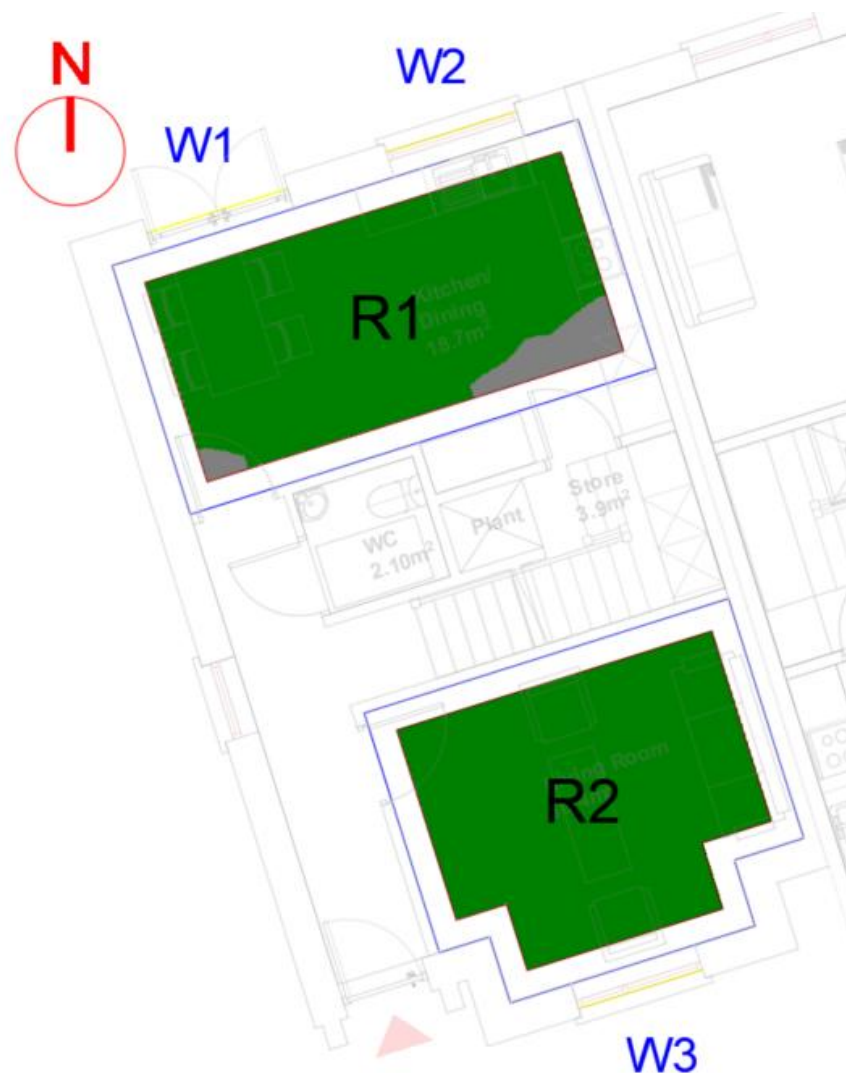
Proposed Ground Floor sDA Contours of House D-03 3-064
